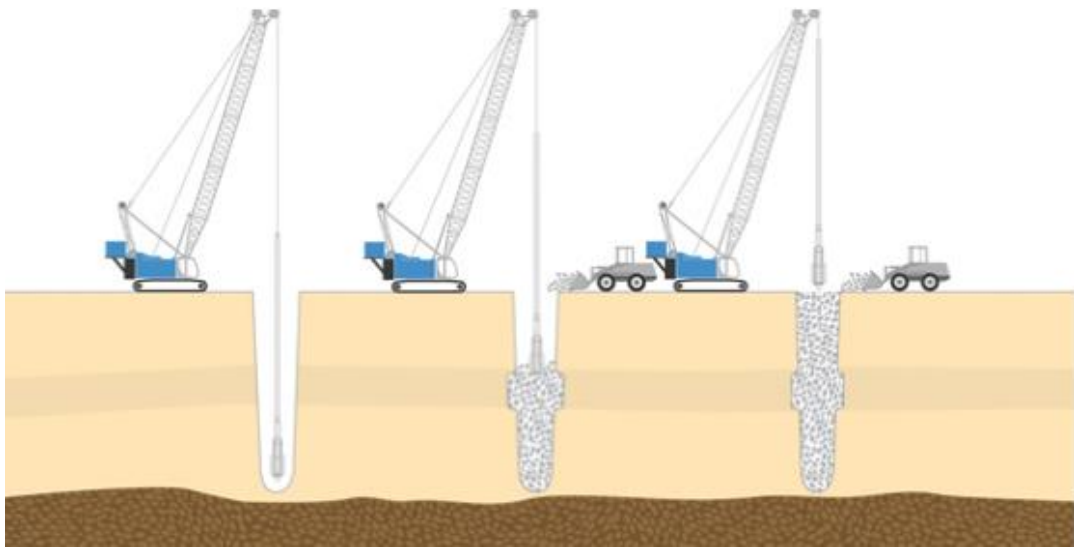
Stone column construction using a crane-suspended downhole vibrator (STA, 2018)
